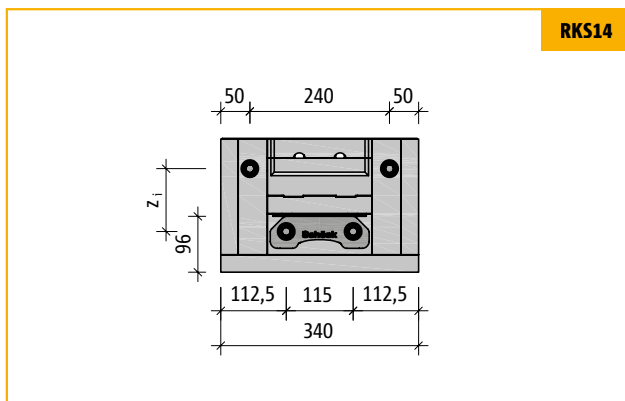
Side elevation from outside: Schöck Isokorb® type RKS14
